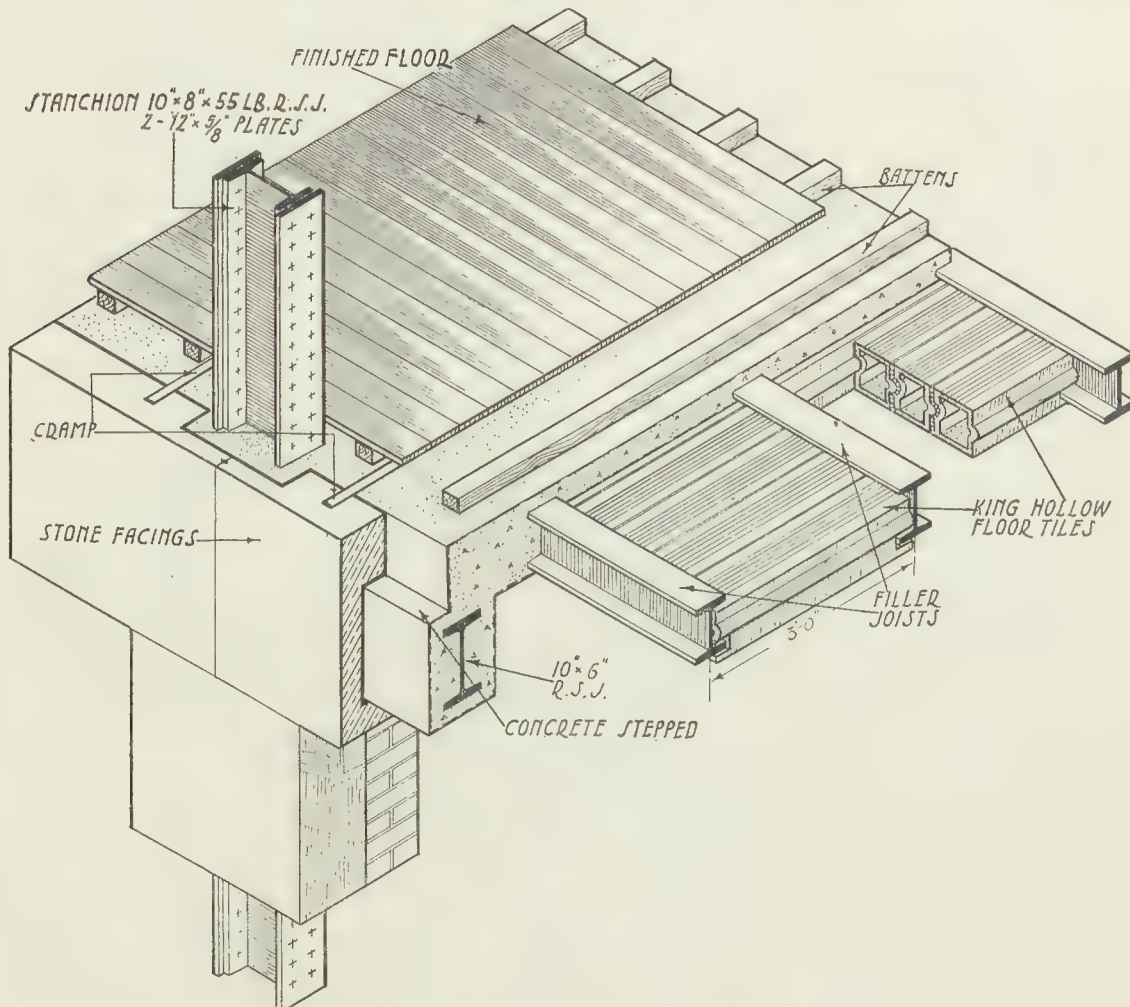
"KING" HOLLOW BLOCK AND FILLER-JOIST FLOOR CONSTRUCTION
